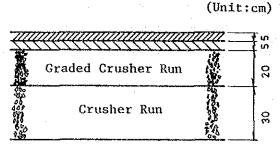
(2) Standard Cross Section of Pavement, Light Duty
